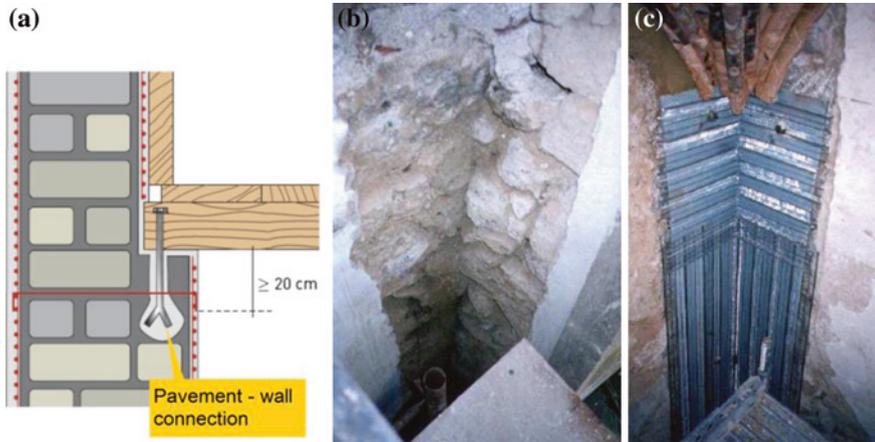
a Connections wood pavements-masonry wall; and b and c between orthogonal masonry walls (adapted from [22, 26])
